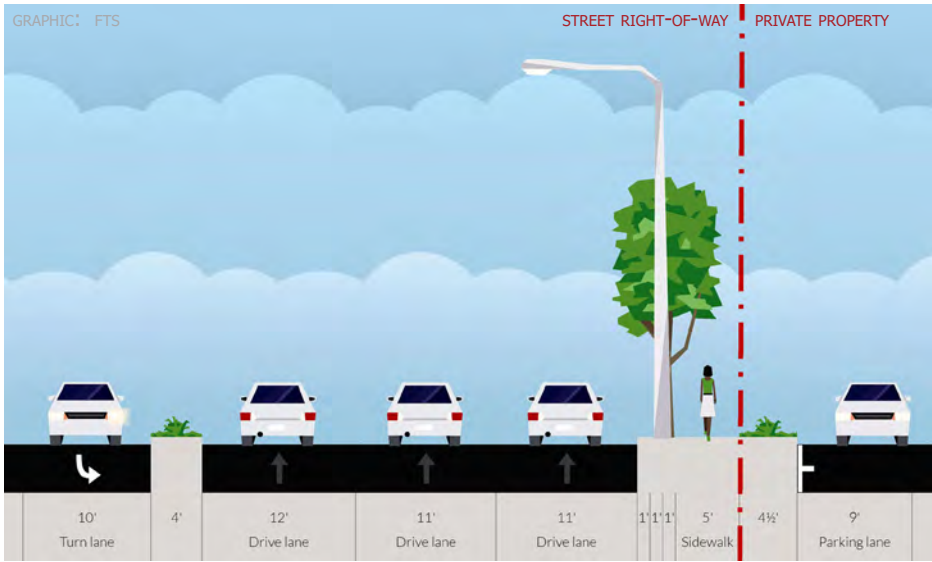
D.1 EUCLID STREET PARTIAL CROSS-SECTION DIAGRAM APPROXIMATELY 300 FEET SOUTH OF CONDOR AVENUE - EXISTING NORTHBOUND LANES
